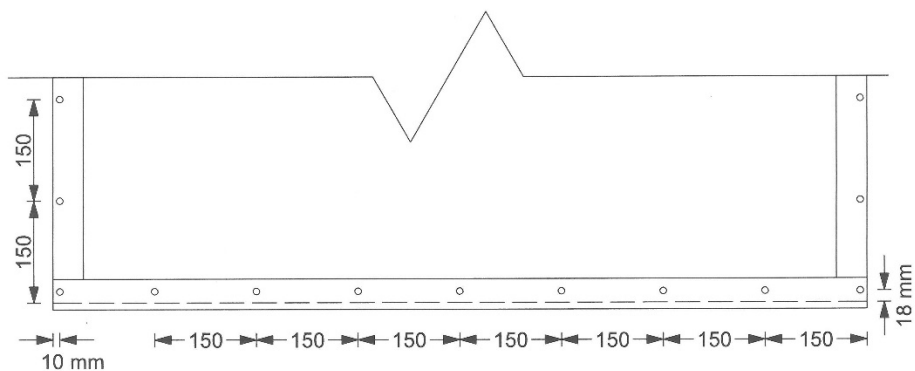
Daiken Customwood 1200 mm Long Specimen Fastener Spacing Pattern
